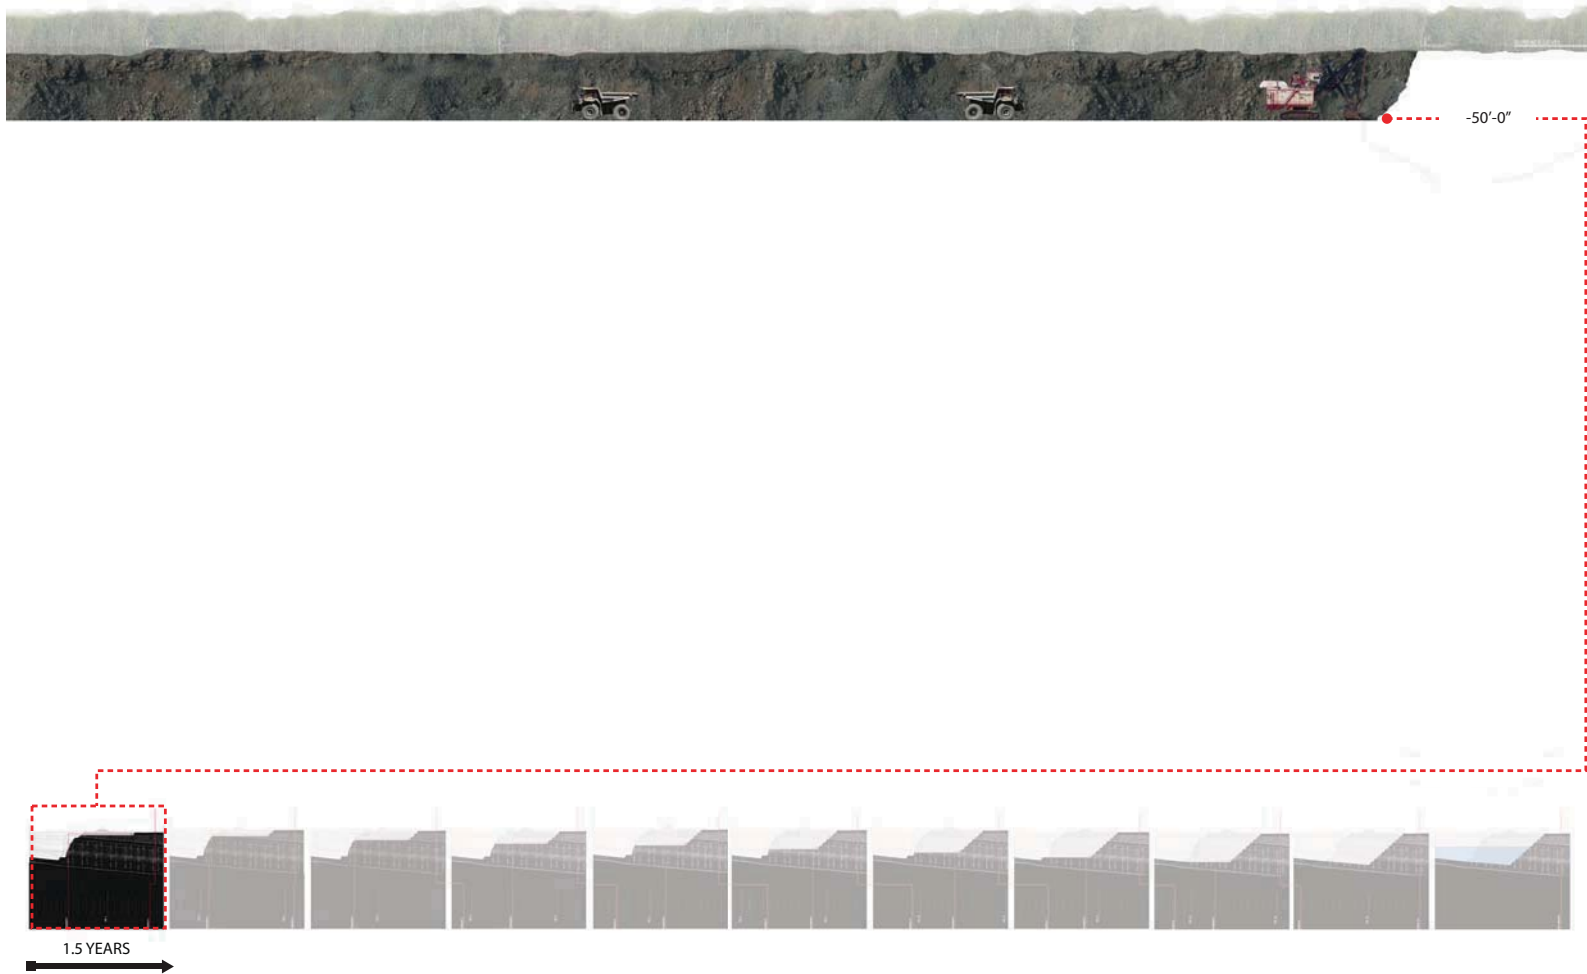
Elevation and Section of Site Change Sequence, Bench 1.
